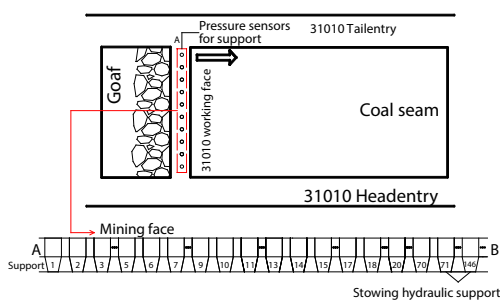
The lay-out drawing of fully mechanized equipment of No. 15-31010 work face
